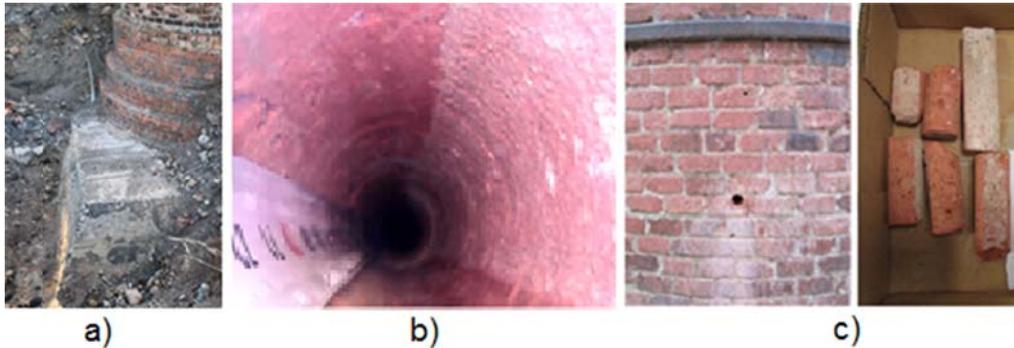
Study in-situ of the structure: (a) foundation; (b) endoscopy on the chimney's wall and (c) extraction of samples.
